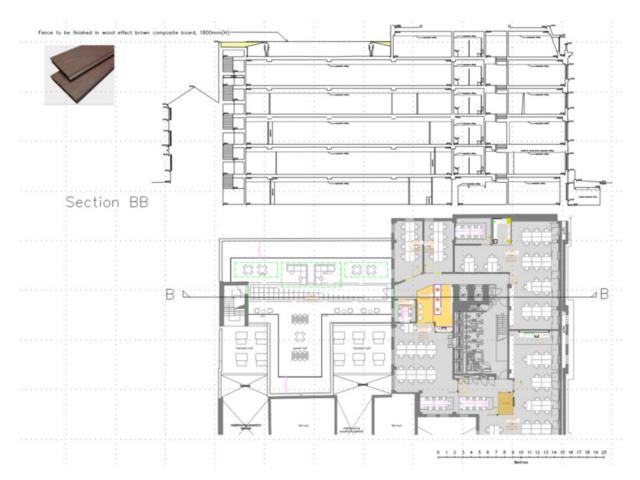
(above): Proposed roof plan and section showing the location of the privacy screen enclosing the terrace
